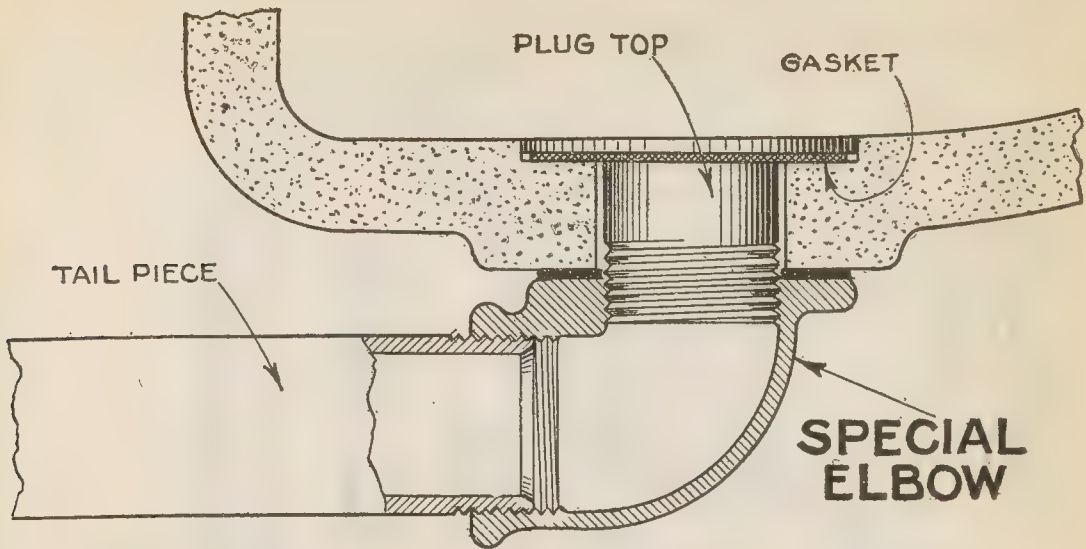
,490.—Plug top and special elbow connection for high up horizontal tail piece.
